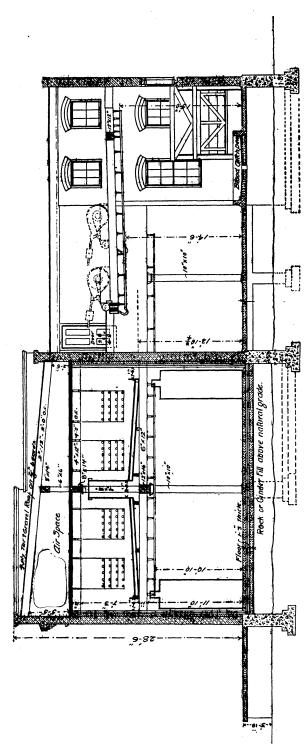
,—Cross section of municipal slaughterhouse. (Section on line E-F in fig. 17.)
